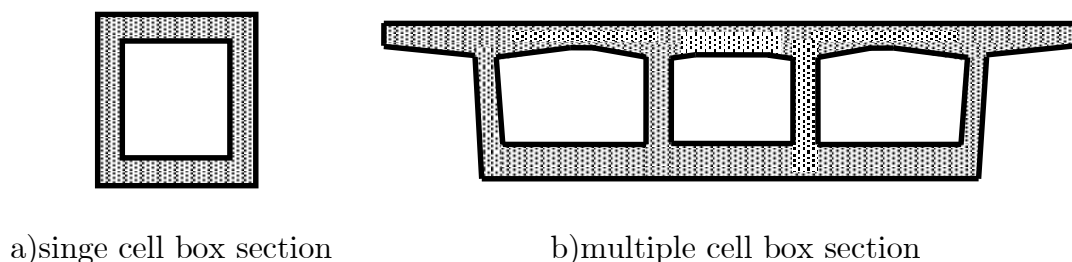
Types of Cross Sections for Bridge Girder [Reference. 1]
